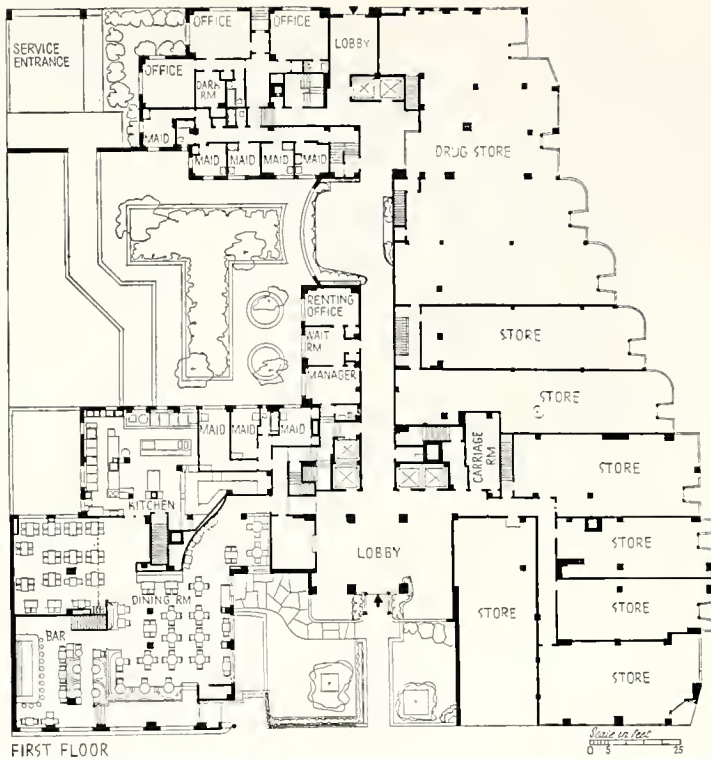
The first floor plan of the apartment building at 240 Central Park South, New York City. Mayer and Whittlesey, architects. This layout illustrates many of the points discussed in relation to urban apartment buildings located in commercial neighborhoods. The lobby is well segregated from the commercial portion of the building and the main entrance to the restaurant is from the street, although a small entrance is provided off the lobby for the convenience of tenants of the building. While this project is really composed of two separate buildings the first floors of both are tied together. Notice that lobbies are provided on two streets and are joined by a public corridor. Sitting space is provided near the center of this corridor with a pleasant view over a little garden. Maids' rooms have been provided, separated from the public spaces by a small hall, and ample facilities have been allotted. Fig. 227. The service entry, upper right, is well separated from the balance of the building and has a canopy for protection. Below, left, is a small sitting space near the main entrance; at right, sitting space near the center of the corridor with a view down the corridor to the main entrance. Simple, plain surfaces have been used throughout. Terrazzo floors, marble and terra cotta wall surfaces, metal column coverings, and simple lighting fixtures. The use of interior planting as a decorative feature has been successful. The landscape design is by Eleanor Robertson Paepcke and Cynthia Wiley, landscape architects.
